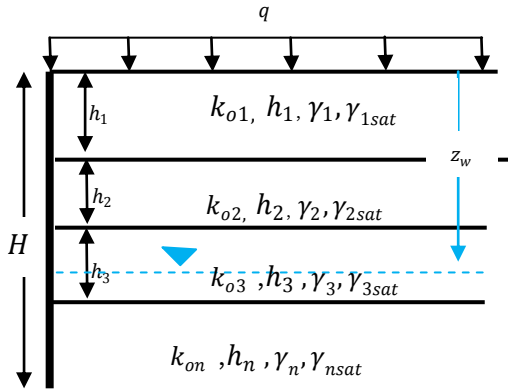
Multi layer soils with a retaining wall of vertical backface.
